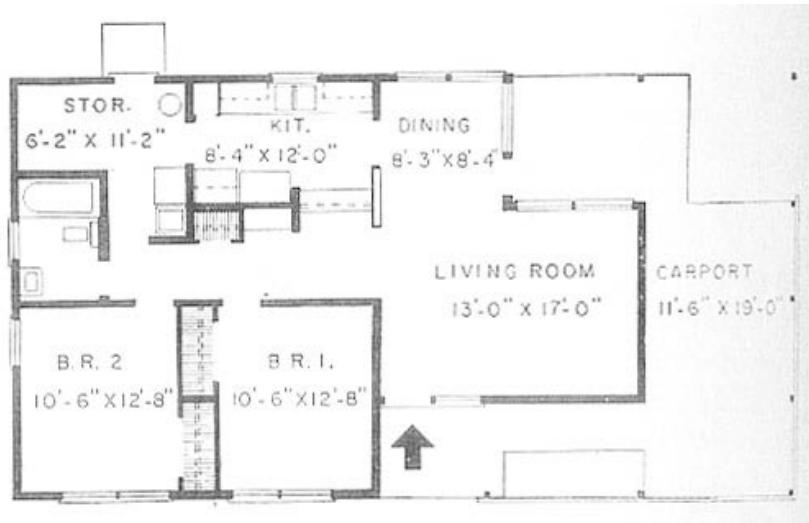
10 Plan for "Plan A" at Sherman Park in Reseda. Note open kitchen, dining and living room area. "The Fickett Formula," *House and Home*, March 1953, 134. Permission pending.
